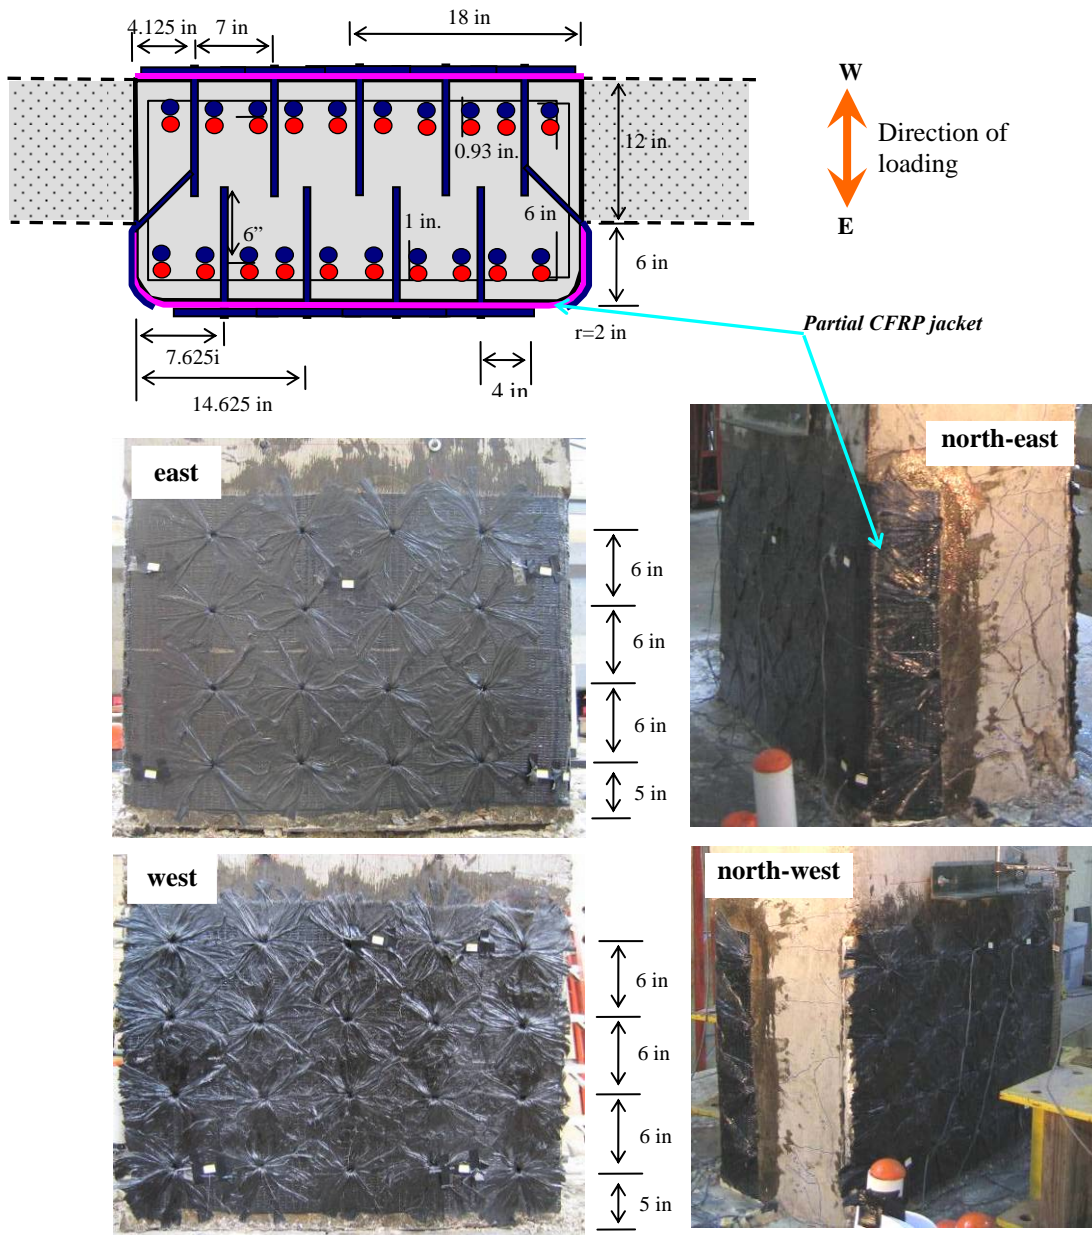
Layout of the CFRP jackets and CFRP anchors, 6-C-R20-C
